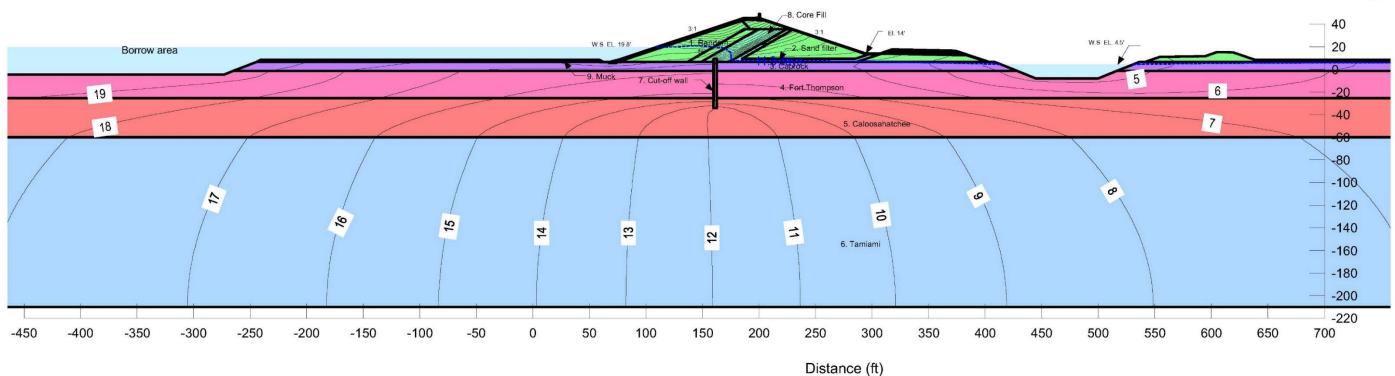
Critical Section for Rapid Drawdown - Cross Section F(L)
